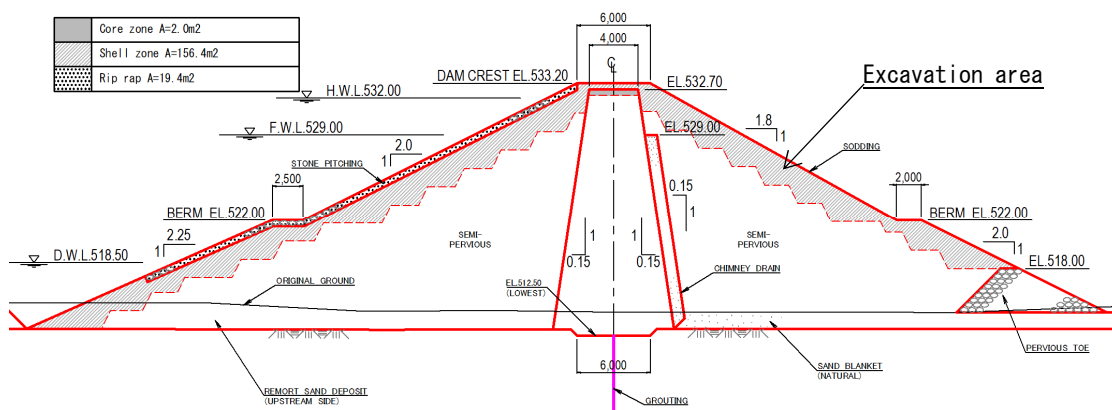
The Typical Cross-Section of Excavation for Rehabilitation (Magudu Dam)
